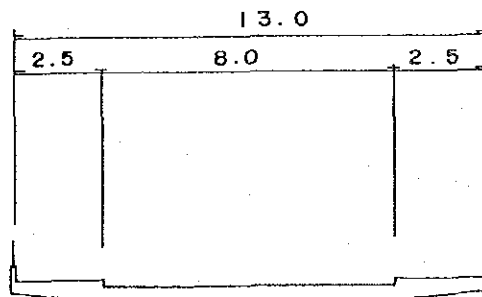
Standard Cross-Section of South Link of Inner Ring Road and Bridge
